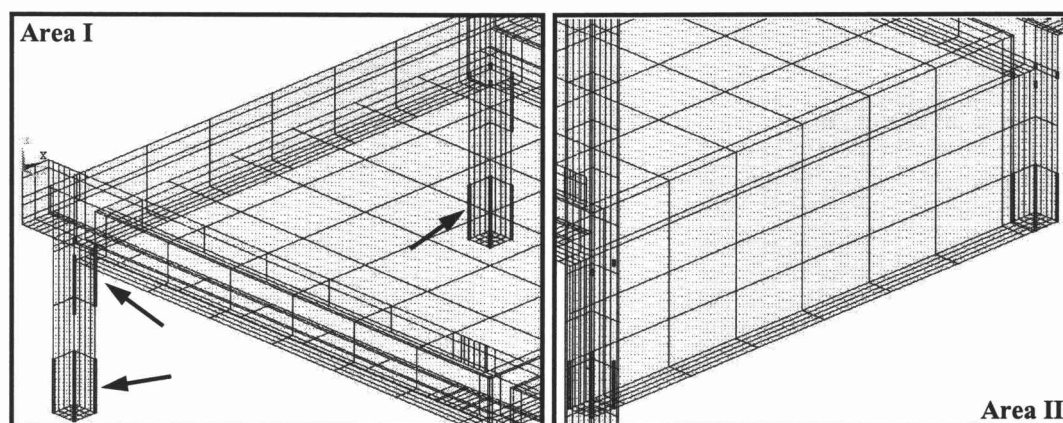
Typical Yielding in Reinforcing Steel at Failure
